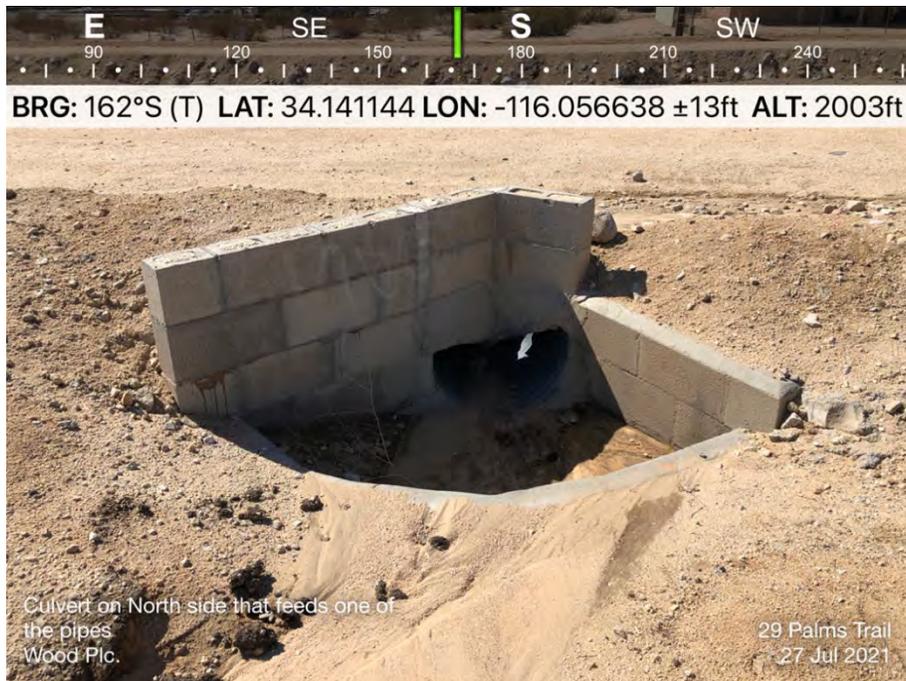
Culvert intake for one of the pipes shown in Photo 9.
